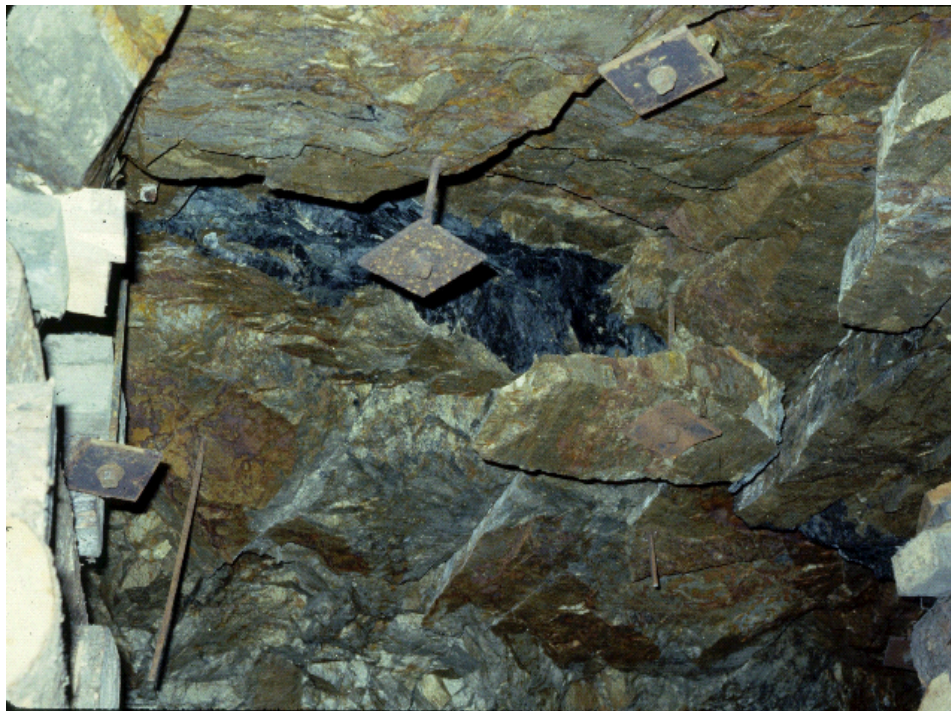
Rock spalled from behind the plates of mechanically anchored bolts
